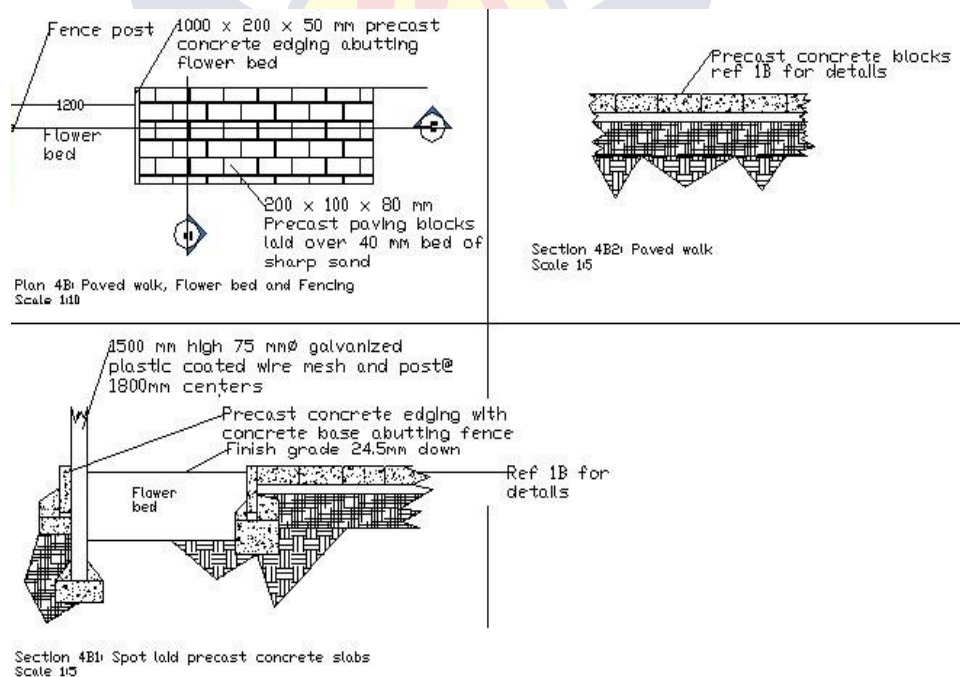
13: Detailing LLSite2 B4– Galvanized wire fence, border and pavement
